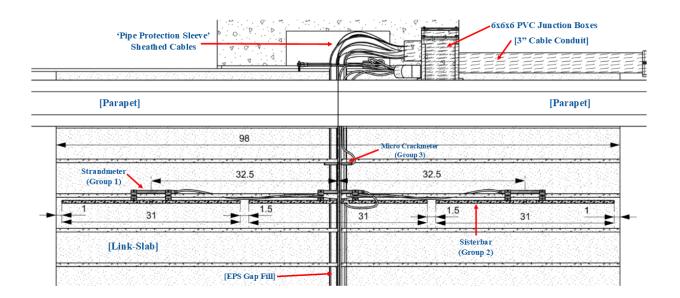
, Drawing, Top View Detail of Link-Slab (Southwest Side)
